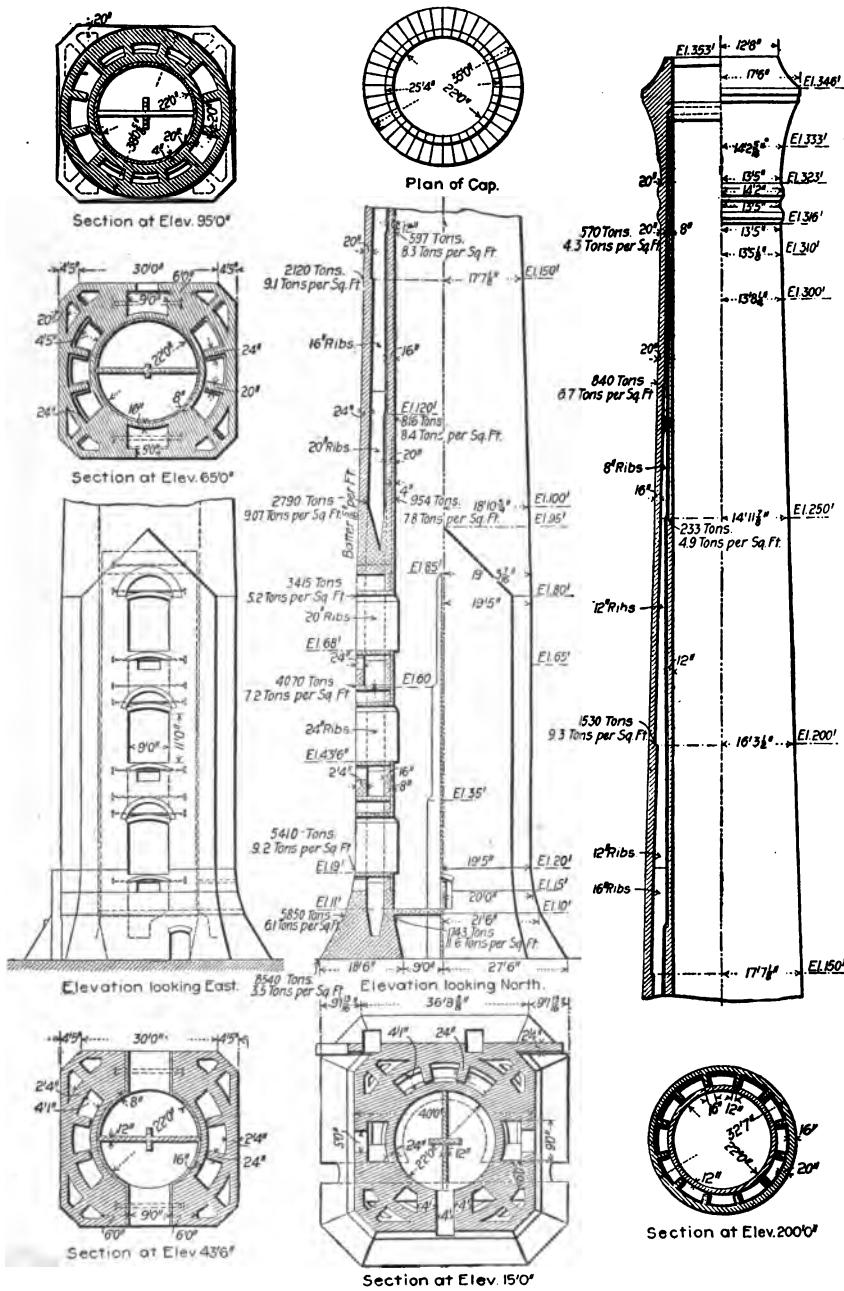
Chimney, Metropolitan Street Railway Co., New York.
